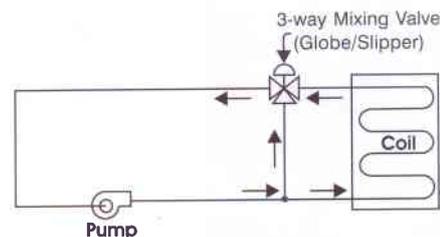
Piping connections with Globe or Slipper type 3-way mixing valve.
